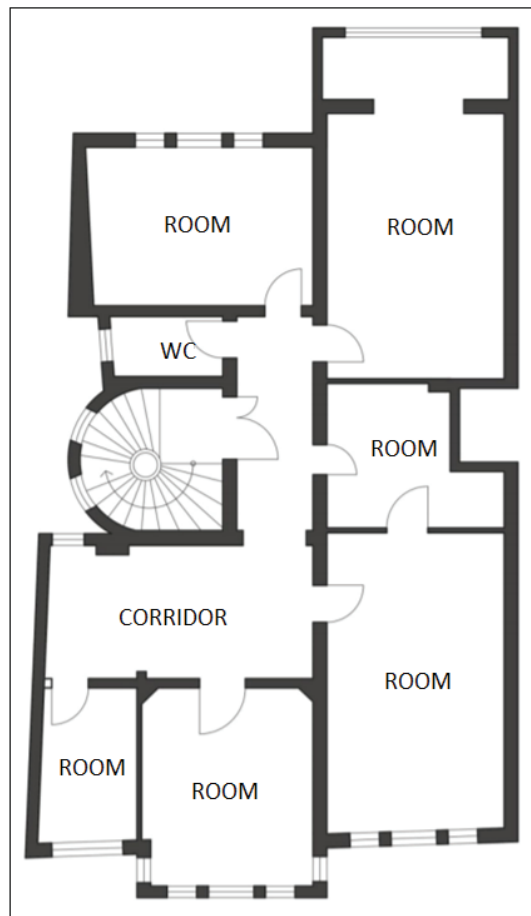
First floor plan of Selim Bey Mansion. (Source : İgüs 2015)
